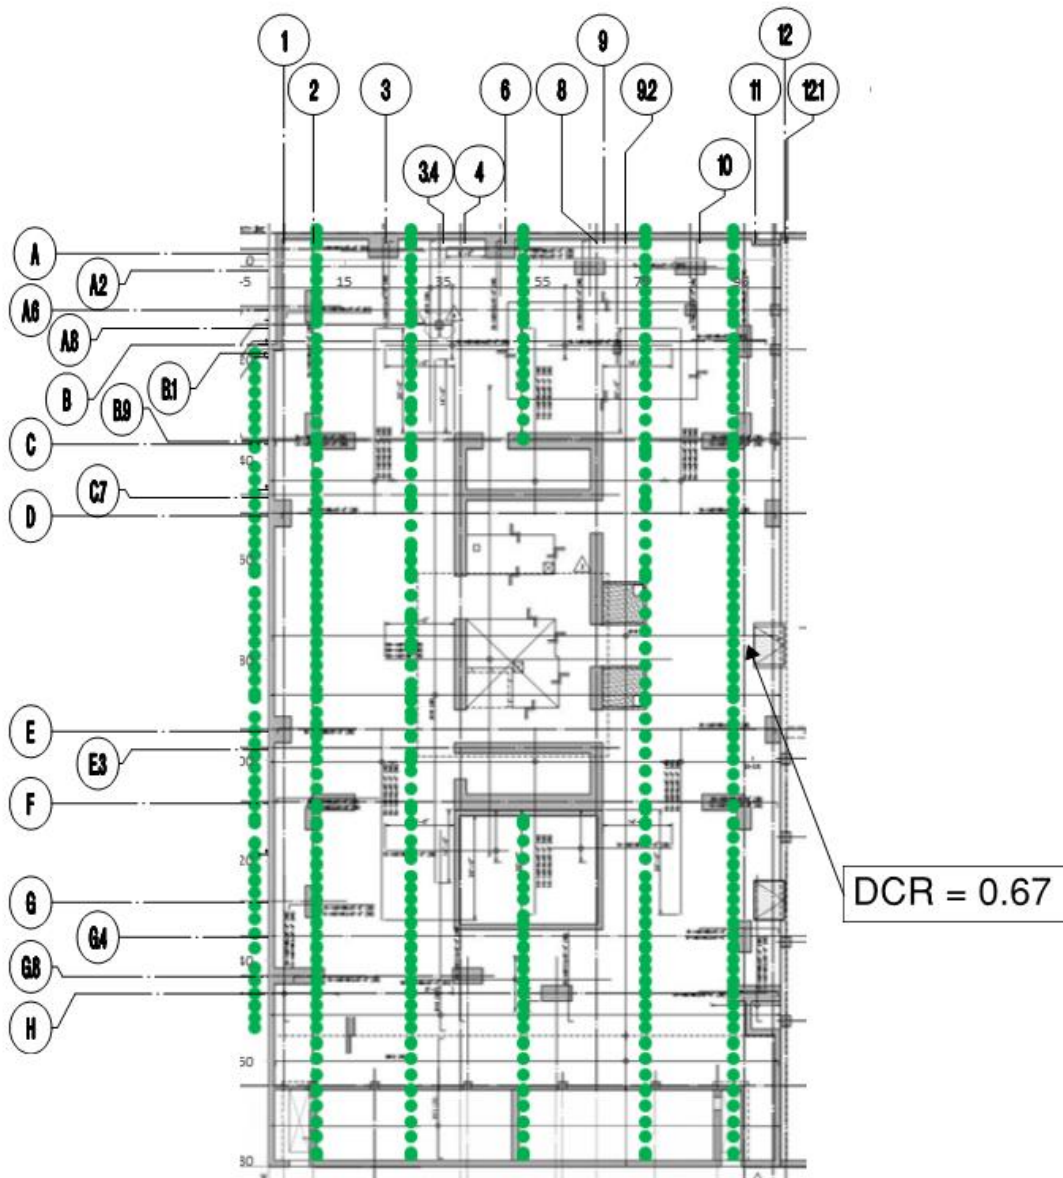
DCR Plot for North-South Top Reinforcement Design Strips for Gravity Load Envelope with Jacking Loads
